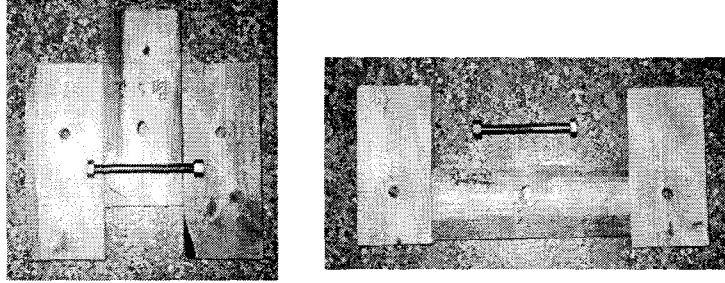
Failure modes for double shear bolted connections with softwoods and 15.9mm bolts
